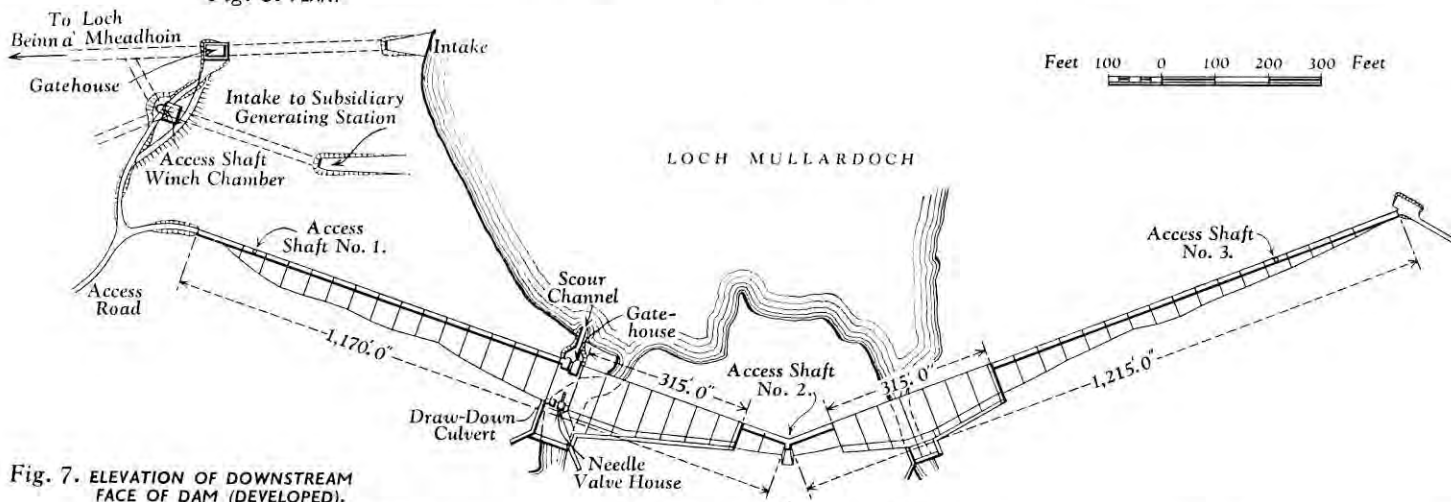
ELEVATION OF DOWNSTREAM FACE OF DAM (DEVELOPED).
